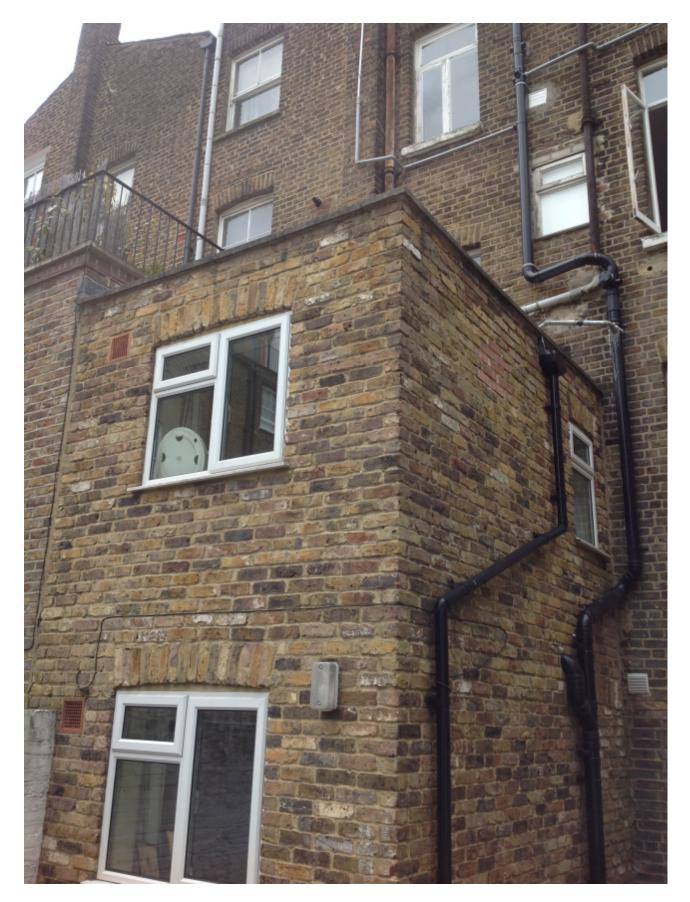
View of existing flat roof from rear courtyard of 44 Chalcot Road
